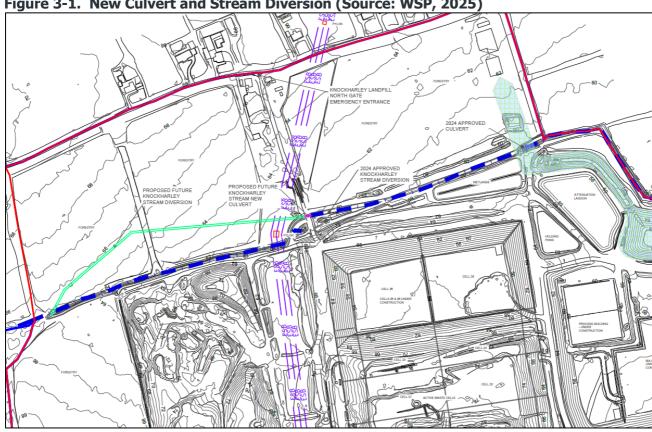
New Culvert and Stream Diversion (Source: WSP, 2025)
